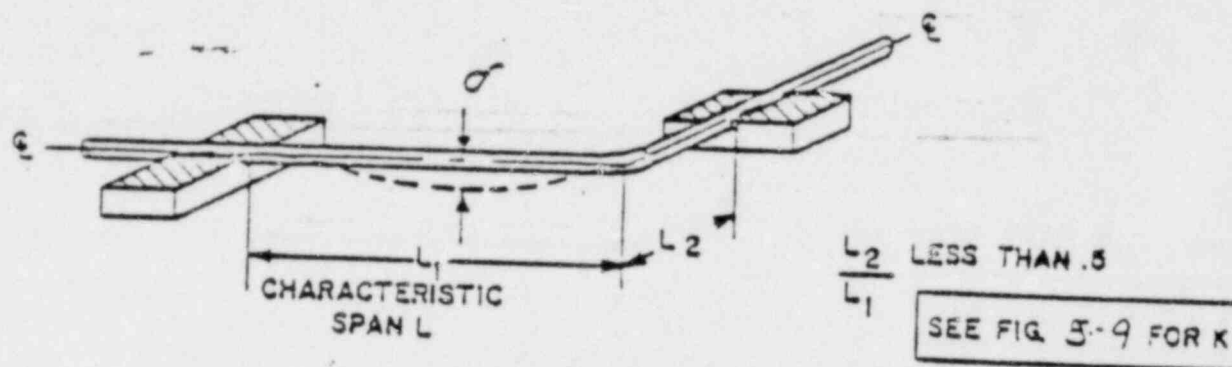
SPAN-ELBOW-SPAN OUT OF PLANE
